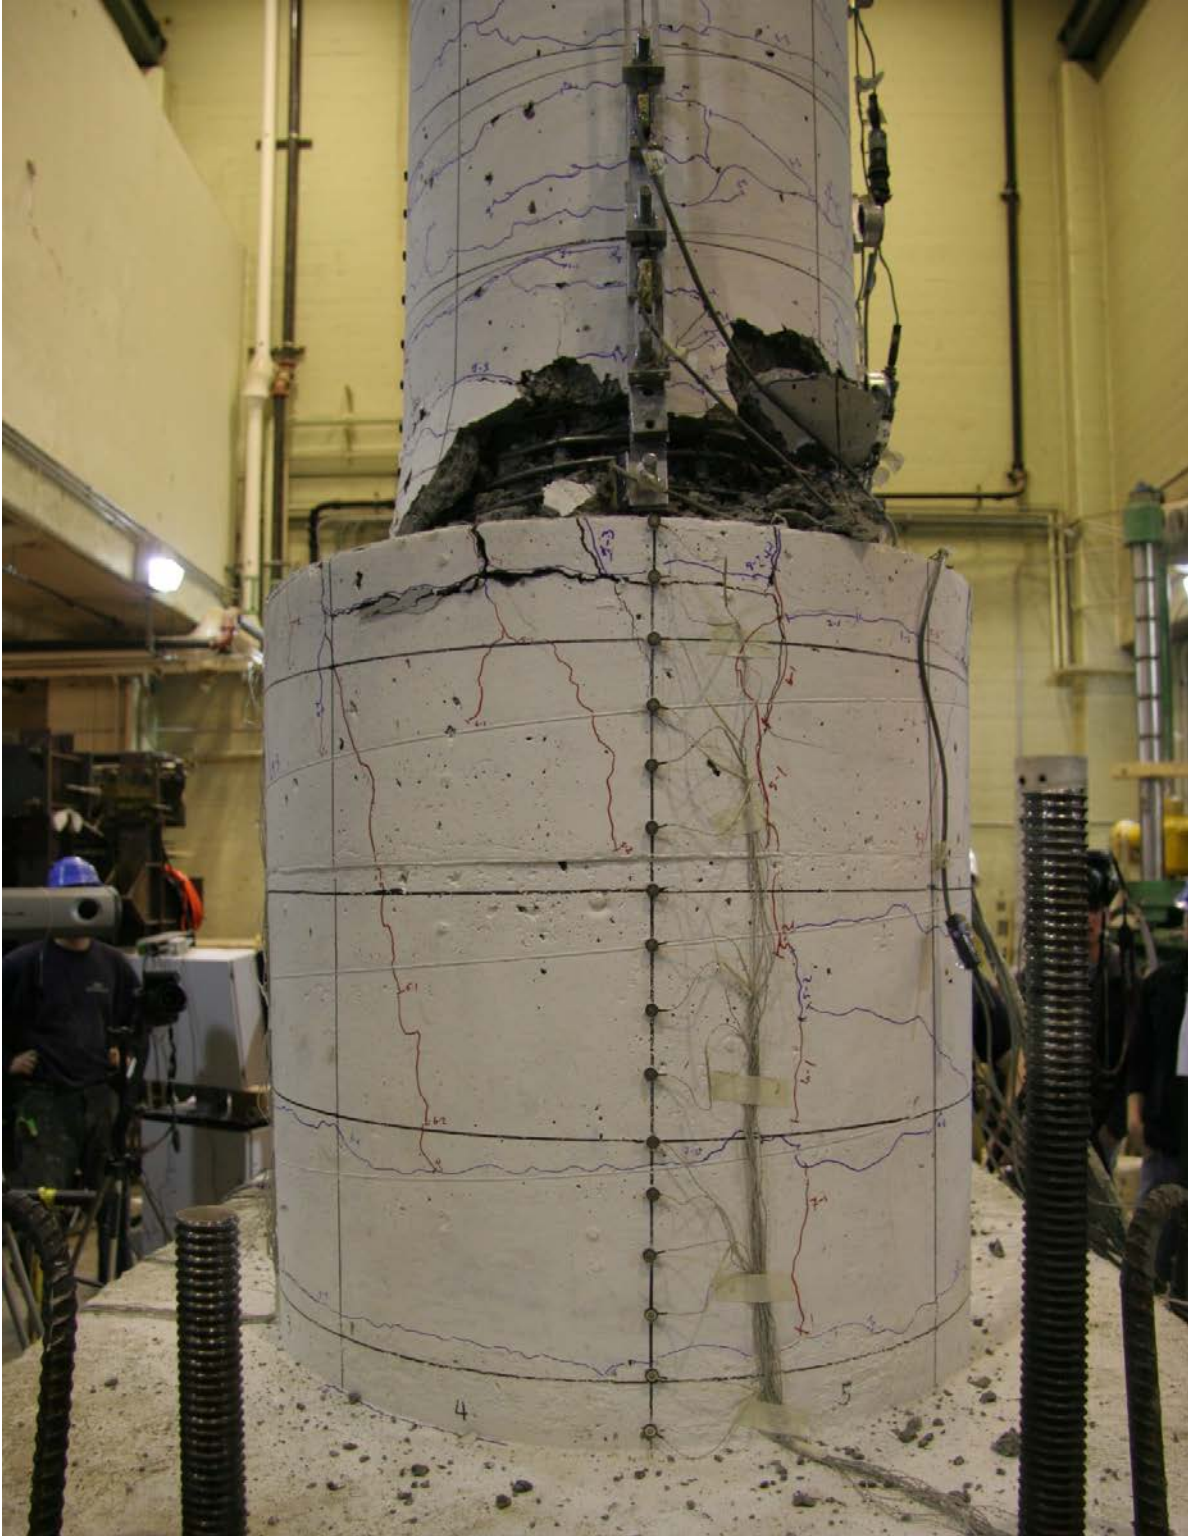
Photo. Specimen DS-1 shaft damage after cyclic testing.
